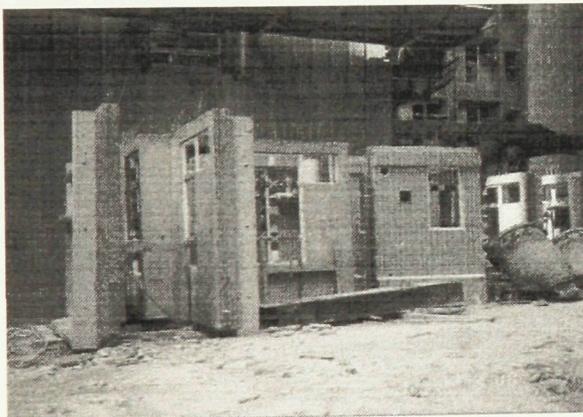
Pre-cast reinforced prefabricated components- external wall (left).
